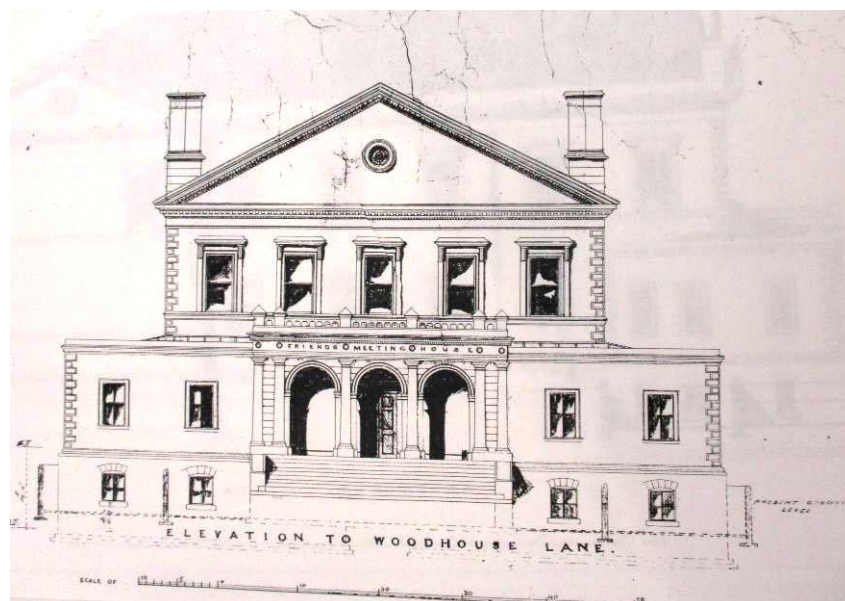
Plan of Carlton Hill Meeting House built in 1868
